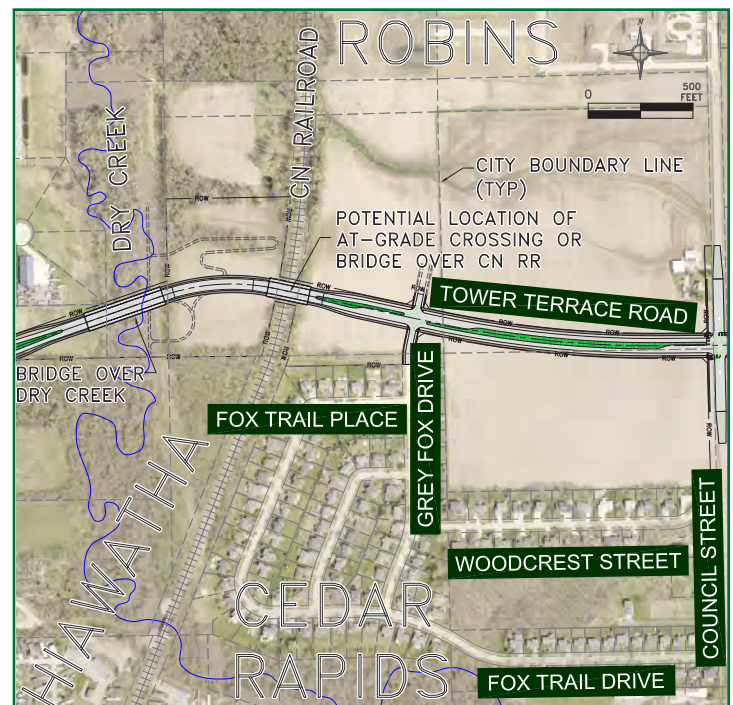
Tower Terrace Road at Grey Fox Drive; Aerial: Linn County, 2018
